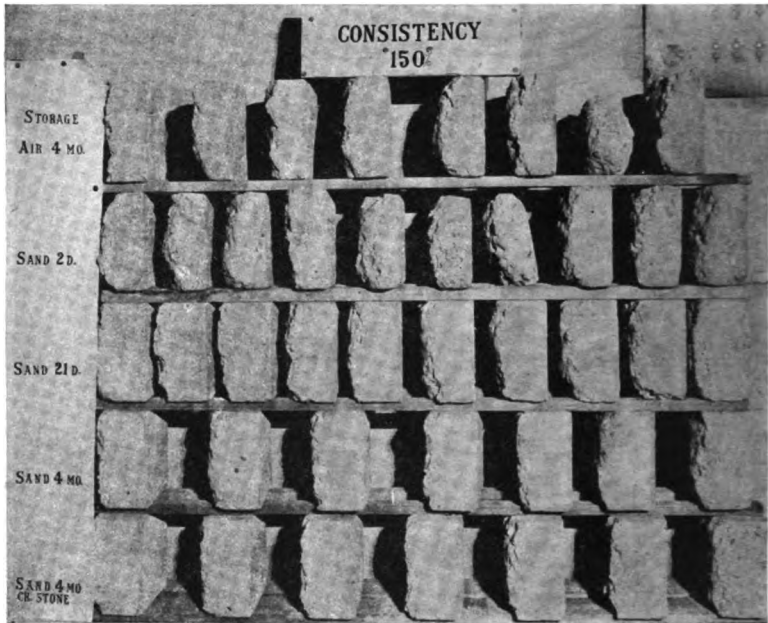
SIDE VIEW OF WEAR BLOCKS AFTER TEST.
